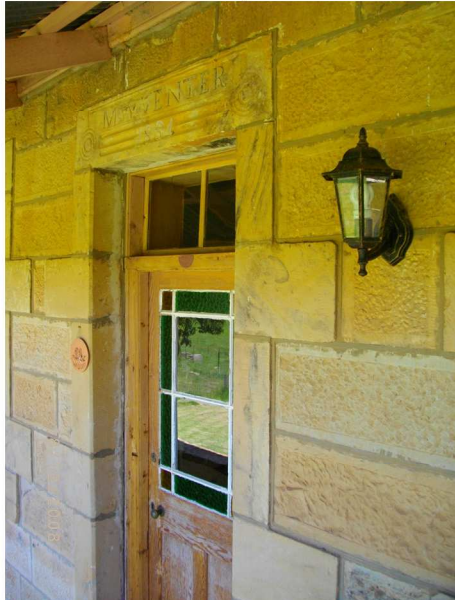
Detail showing the frame around the door and window openings constructed with smooth ashlar and walls in punched ashlar. (2012)
